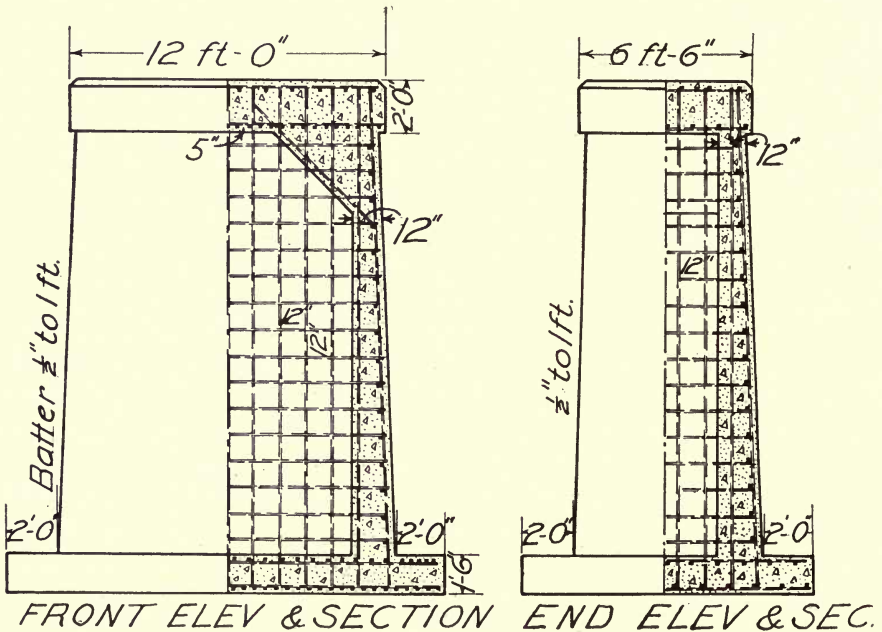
STANDARD REINFORCED CONCRETE PIER, K. C., M. & O. RY.
